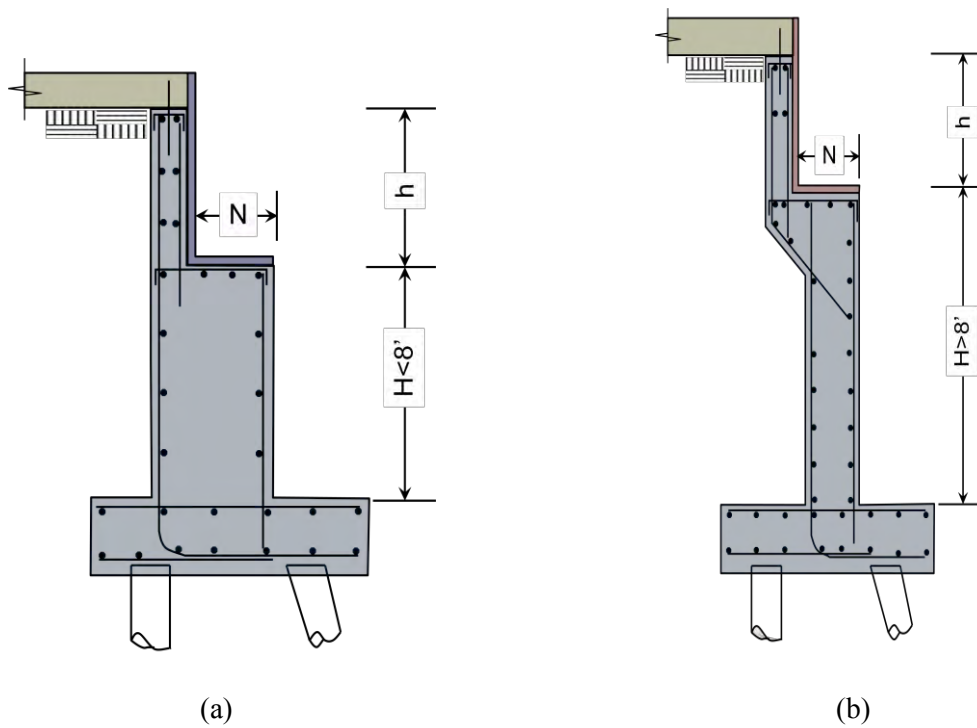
Seat Type Abutments; a) Short Seat and b) High Cantilever
